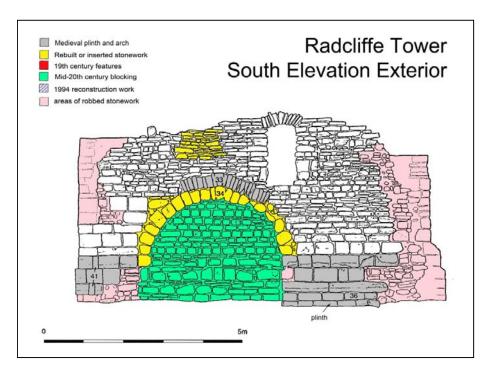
Radcliffe Tower southern elevation exterior 2014.
